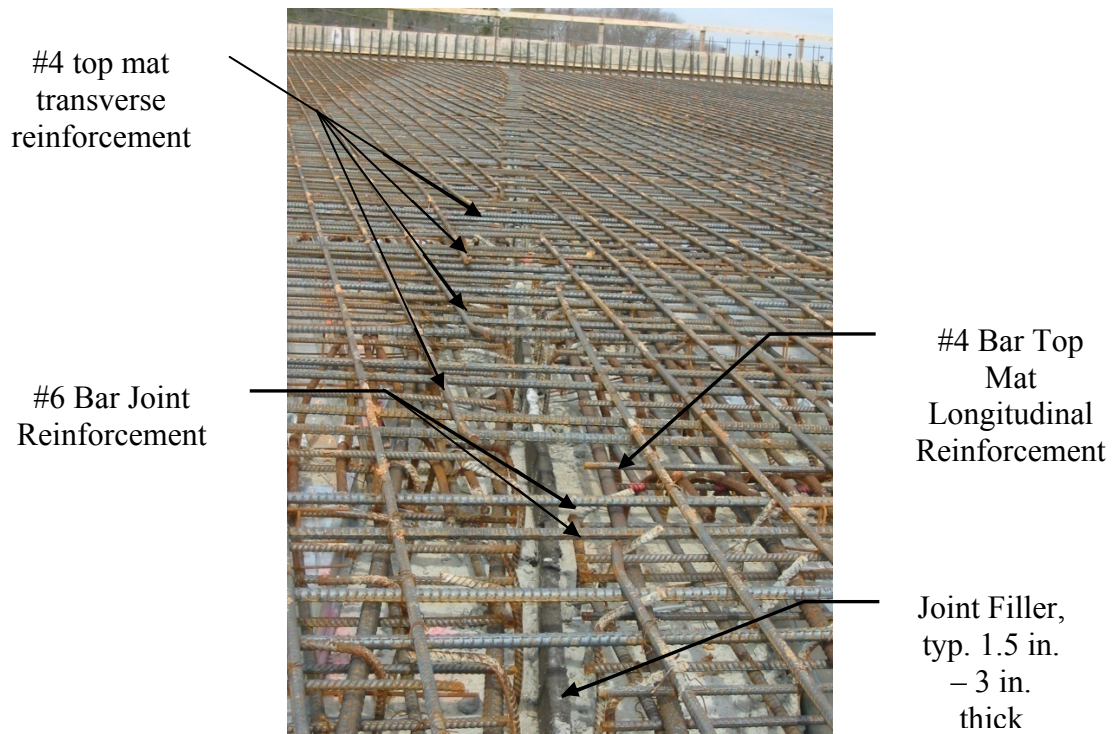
Reinforcement layout for a skewed continuous bridge deck (bridge supporting US 27 at SR-1, Cedartown Bypass)
